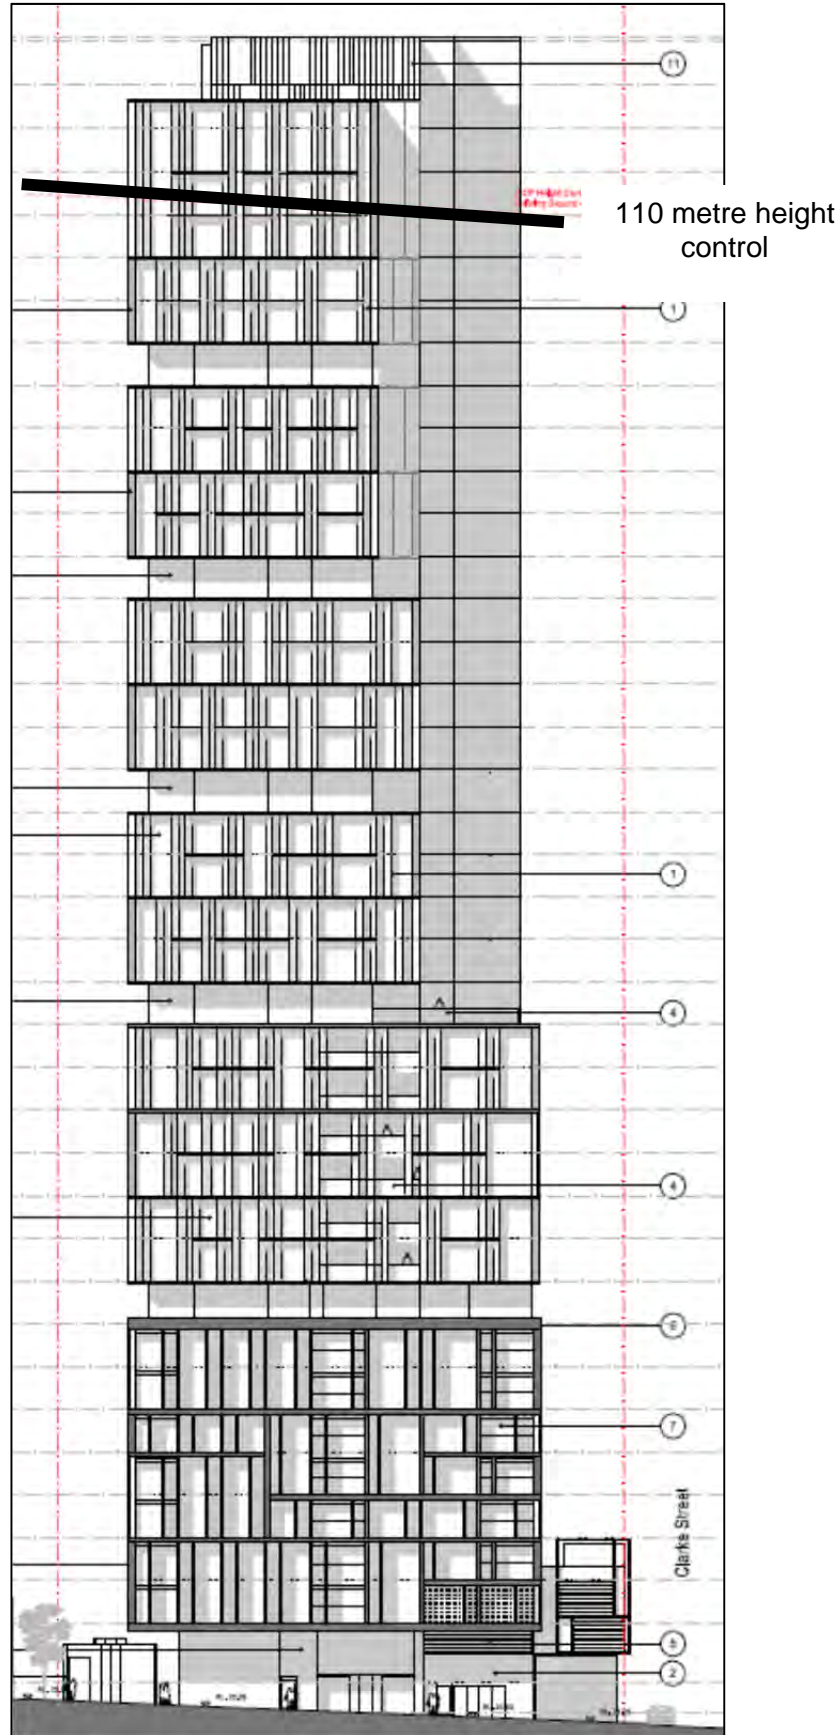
View of the Elizabeth Street elevation illustrating the extent of breach to the building height development standard
